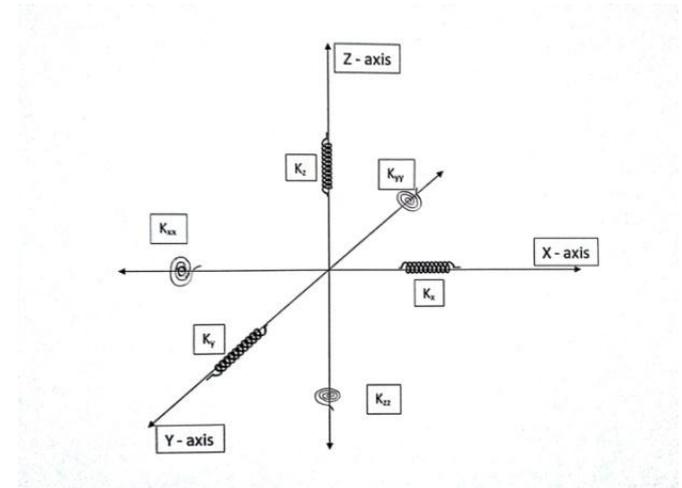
Idealization arrangement at a typical column square foundation strip and equivalent soil spring junction.
